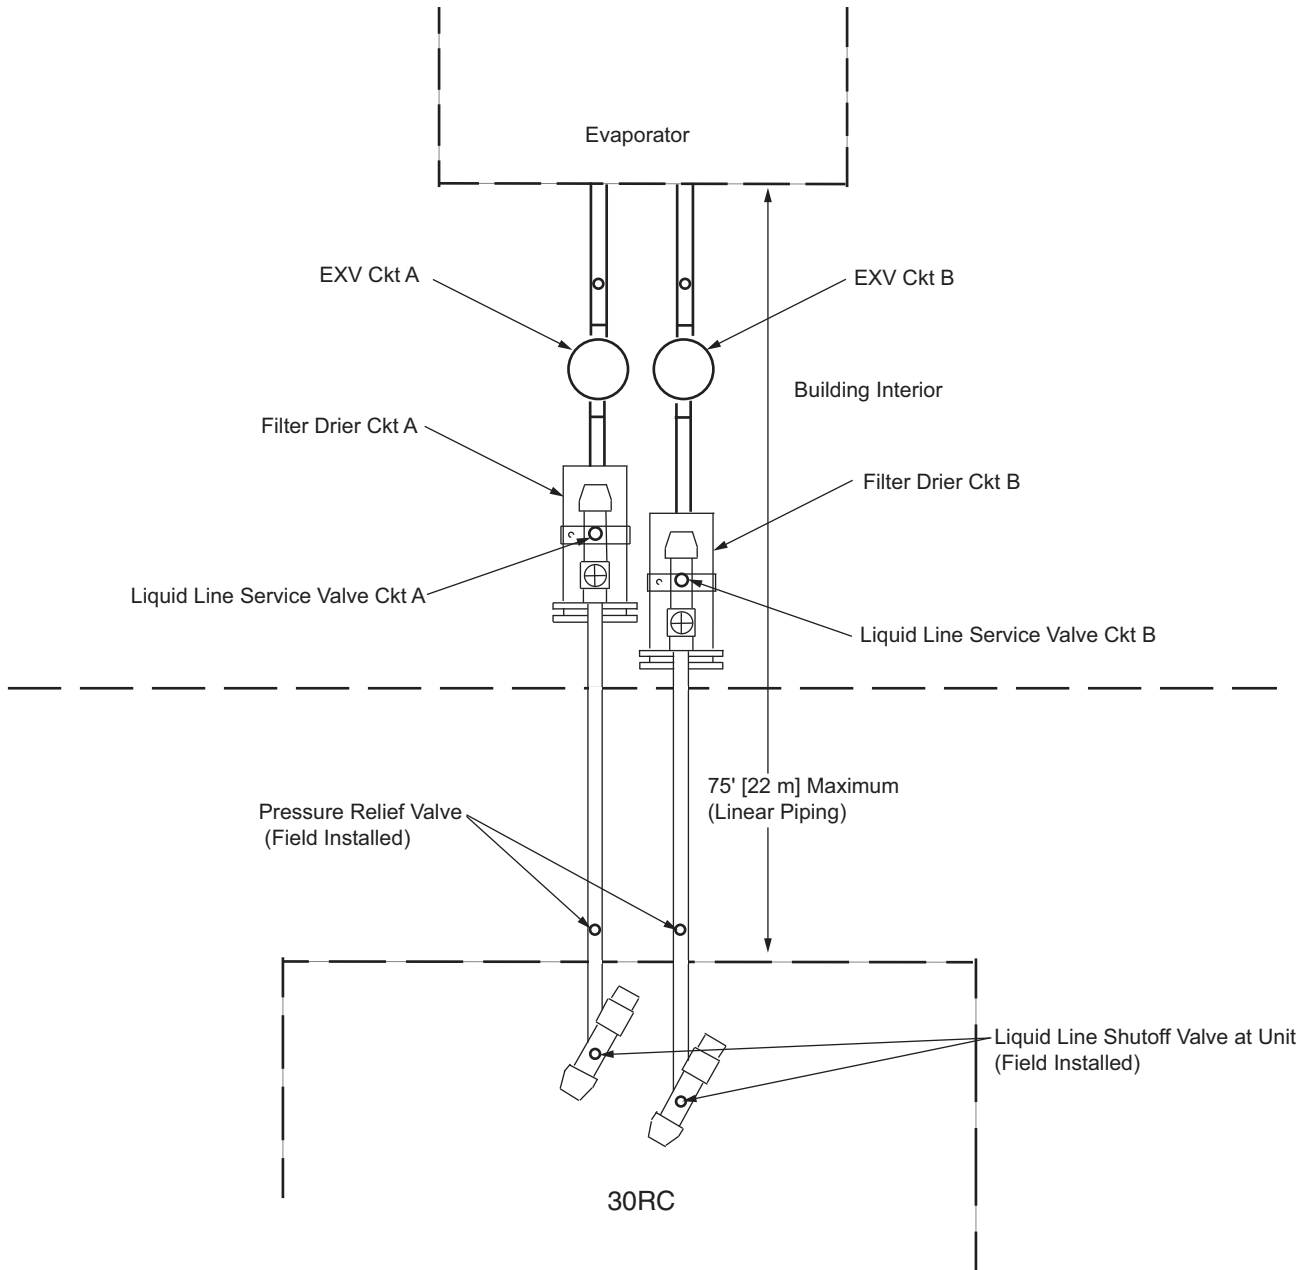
Filter Drier, EXV, and Service Valve Assembly
